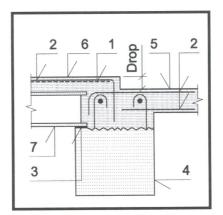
Beam/Hollow Core Slab/In-Situ Slab
